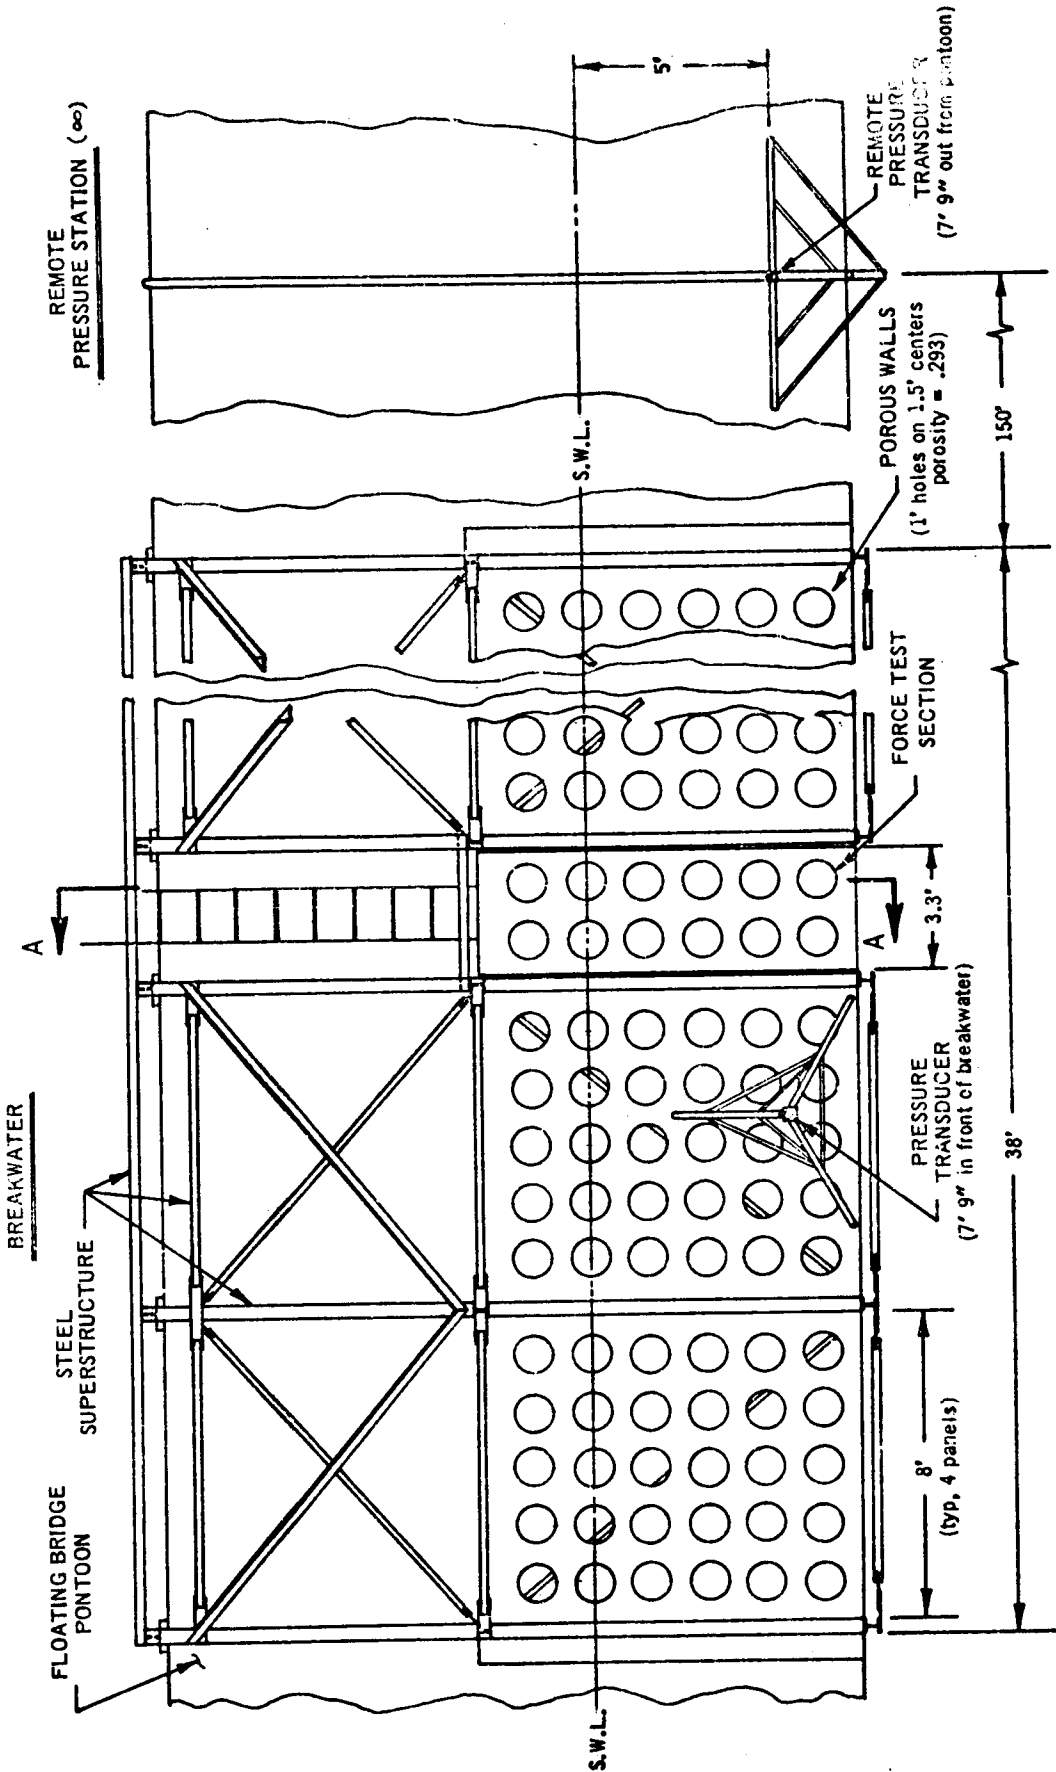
Porous Walled Breakwater and Remote Station; Front View.
